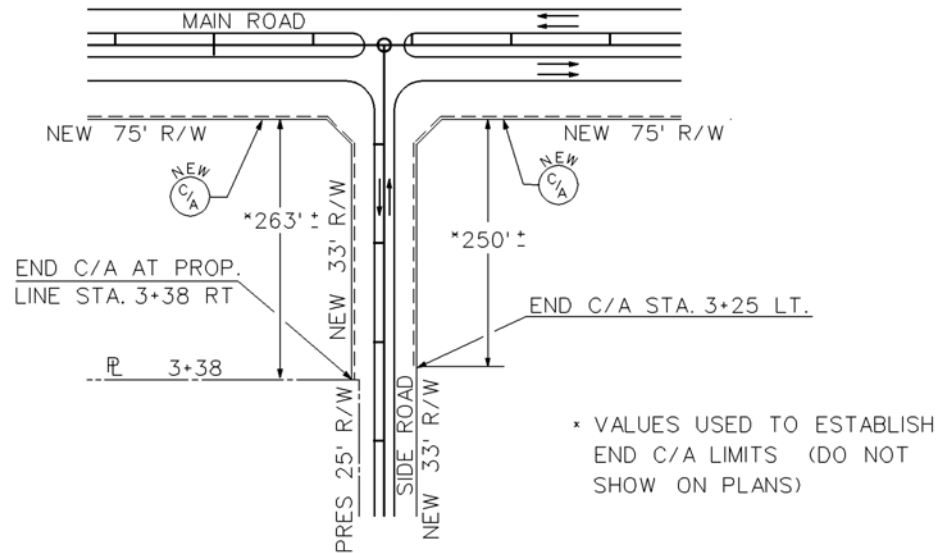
H CONTROL OF ACCESS AT INTERSECTION ROADS
